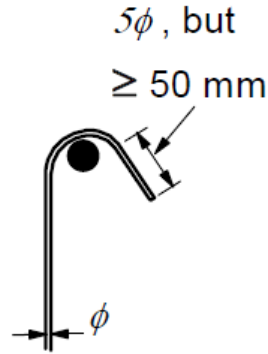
Anchorage of shear reinforcement (Eurocode 2, 2010).
